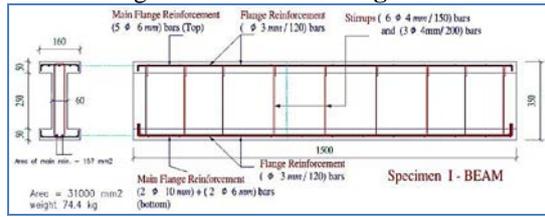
Geometry and Sectional Dimensions of the I-section Reinforced Concrete Beam (units: mm)
